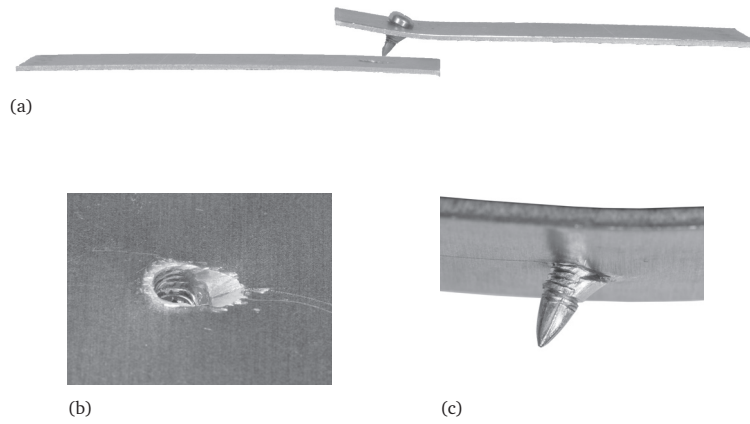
Deformed single lap-joint specimen. (a) Whole specimen. (b) Top side of bottom sheet. (c) Underside of top sheet.
